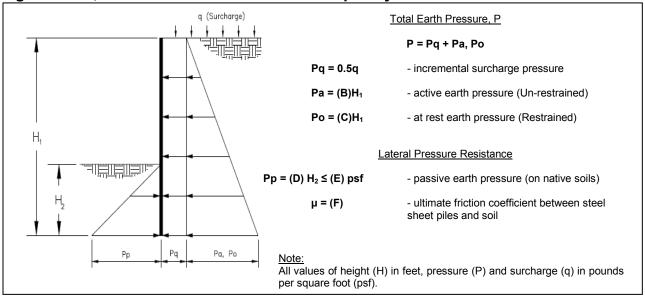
, Lateral Earth Pressures on Temporary Cantilever Wall
